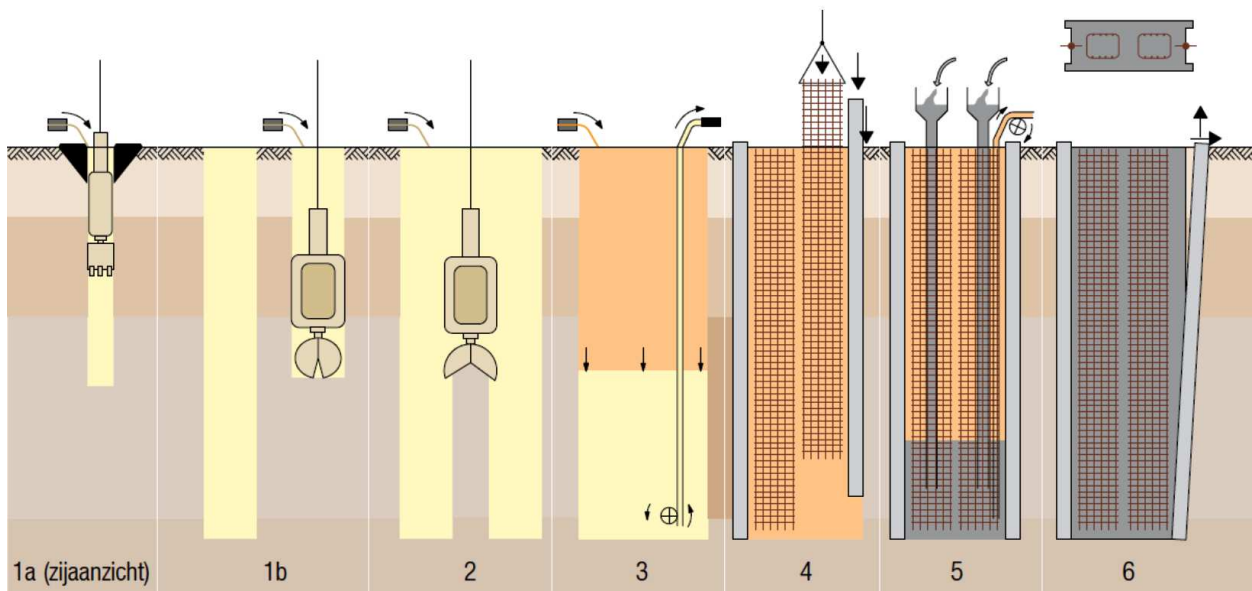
Construction stages of a diaphragm wall (from: <http://www.wtcb.be>)
